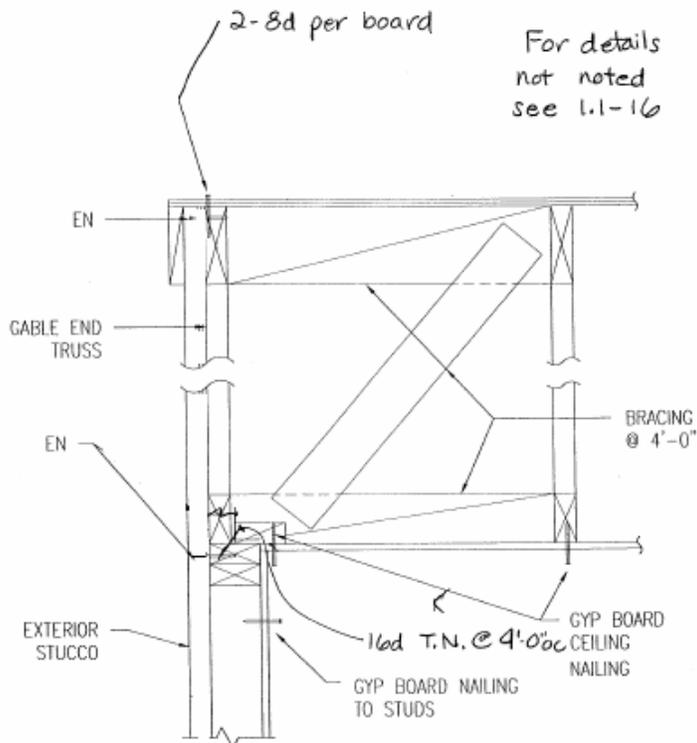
Index building 4 gable end roof typical ceiling (detail 2-S2)
